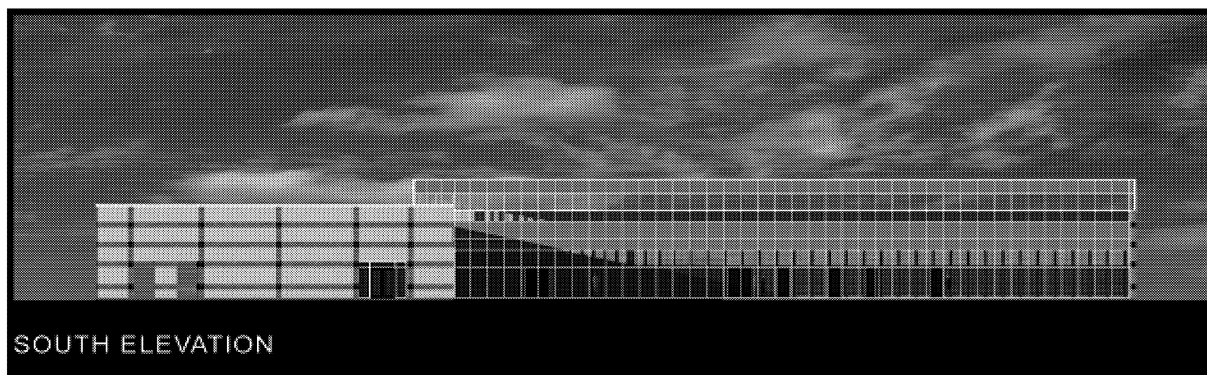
Proposed Architectural Image for the Desalination Plant
